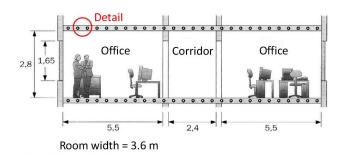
Central room module used for the computer simulation of a building with concrete slab cooling. All dimensions are in meter.
